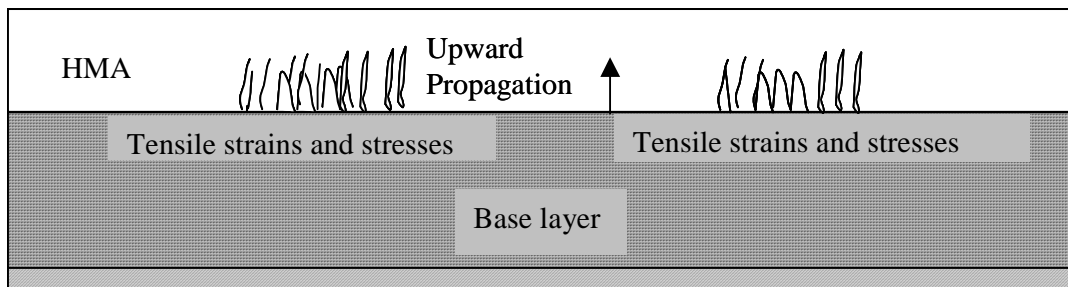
Bottom-up fatigue cracking.
